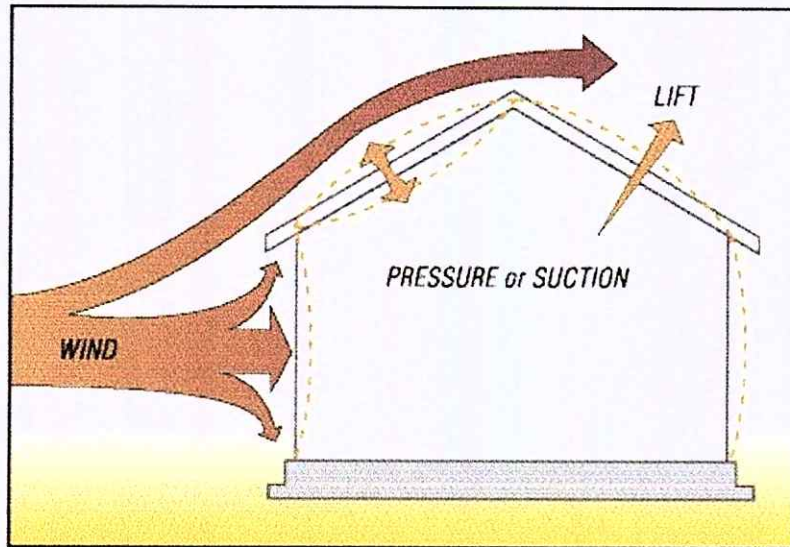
Wind flow over building (Source: Simpson-StrongTie Co., Inc.)
